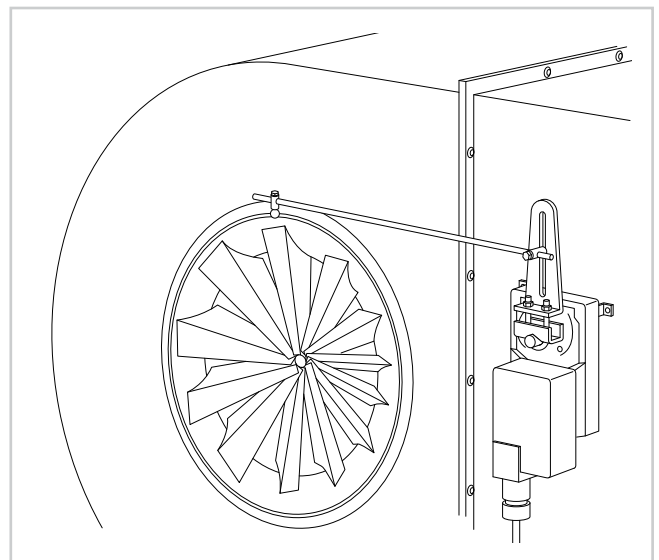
Actuator is mounted to the ductwork and connected to the inlet vanes with a crank arm kit
